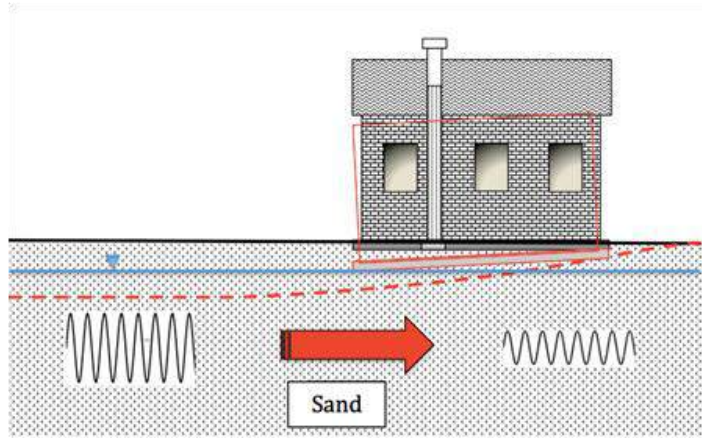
Possible damage mechanisms due to driving of piles or sheet piles, (Massarsch, 2000).
